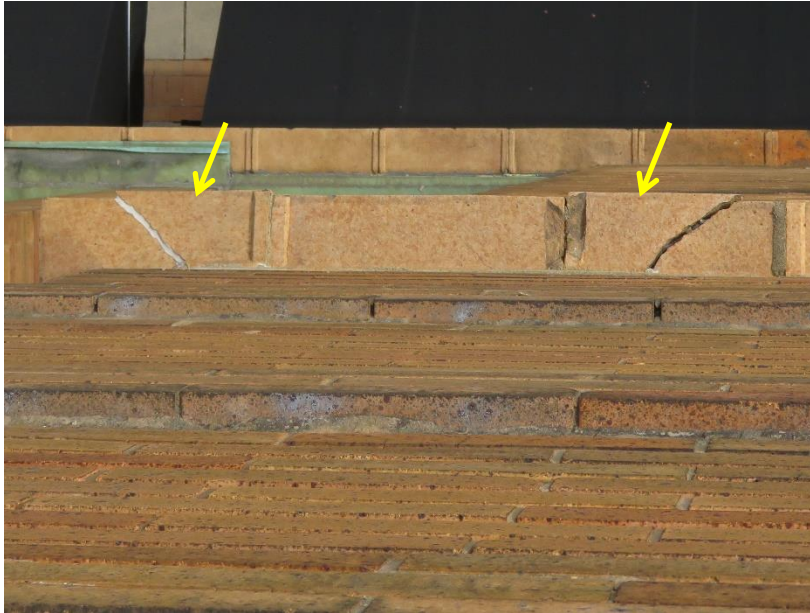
Cracked and displaced terra cotta units on the east facade at the top course above the third floor windows (viewed from the roof)
